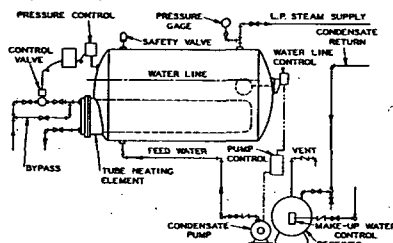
Heat Exchanger Used as Steam Generator Boiler Feed Pumps
